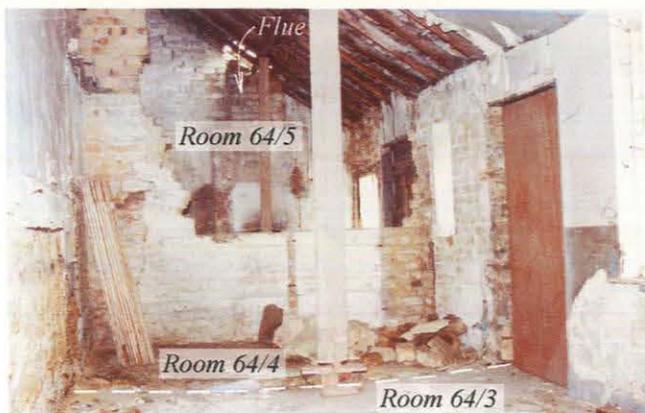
Outbuilding rooms 64/3 & 64/4, looking west; view through the two rooms and featuring the partly demolished partition wall which divides Room 64/4 from 64/5.
